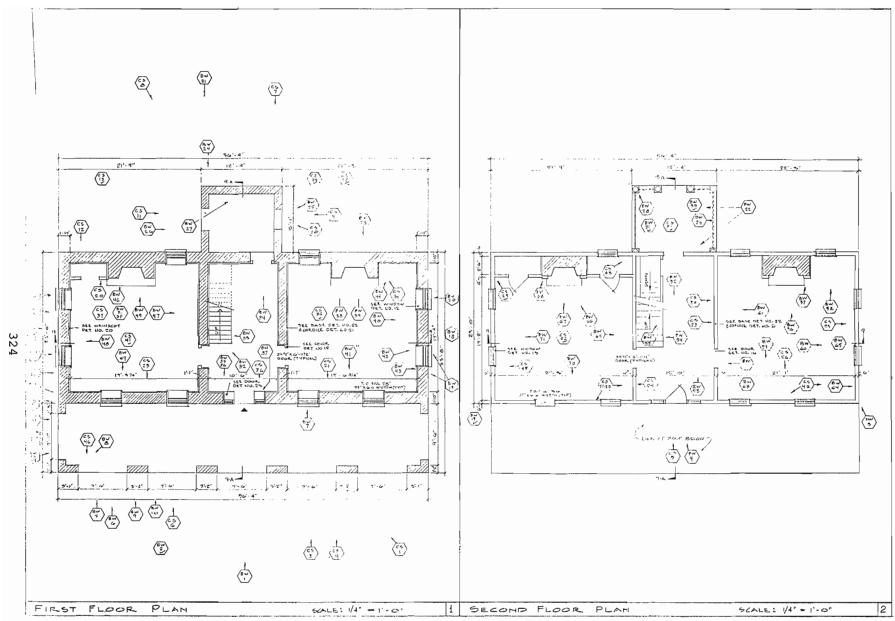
First and second floor plans of the Vanderhorst Mansion, adopted from those developed by Robert Shoolbred Engineers.
